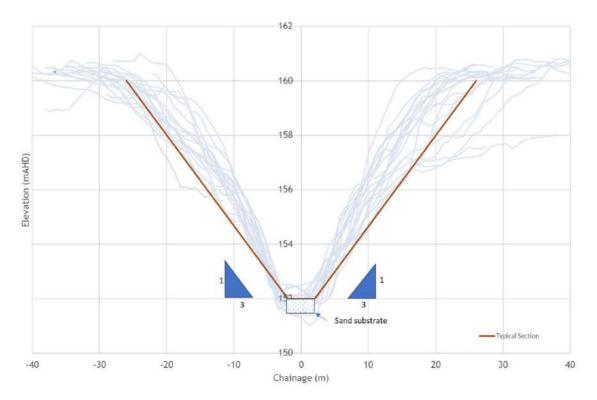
Proposed Roper Creek Diversion cross-sections for the straight and meander sections
